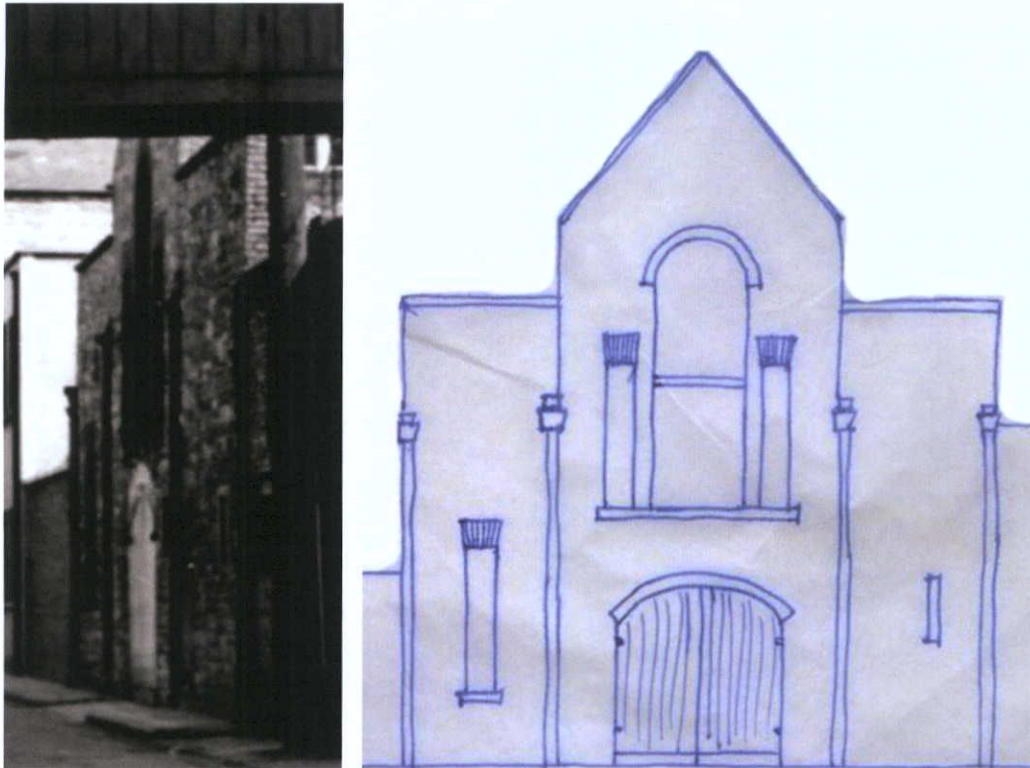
Oblique view of Gilbey's Warehouse onto Moore Lane with rough sketch of the elevation. The façade formed the termination of the vista down Sackville Lane (now O'Rahilly Parade).
